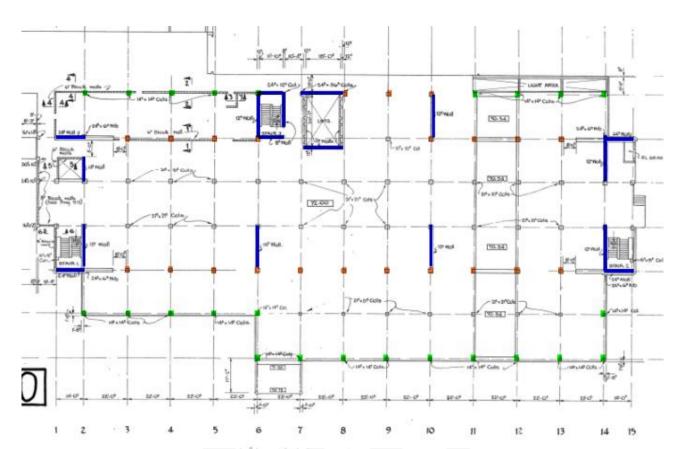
Shear wall layout at ground floor level (dark blue lines)
